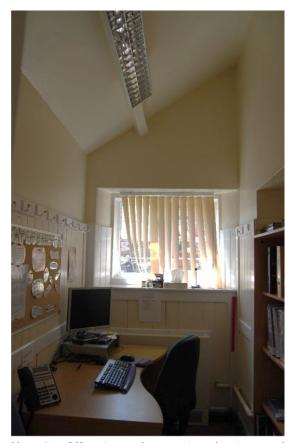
Office in south extension showing wood panelling with coat hooks (from N; 1m scales)
